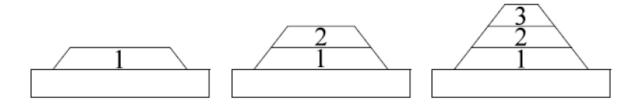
Staged Construction technique showing fills placed in 3 layers (Bozkurt 2014)
